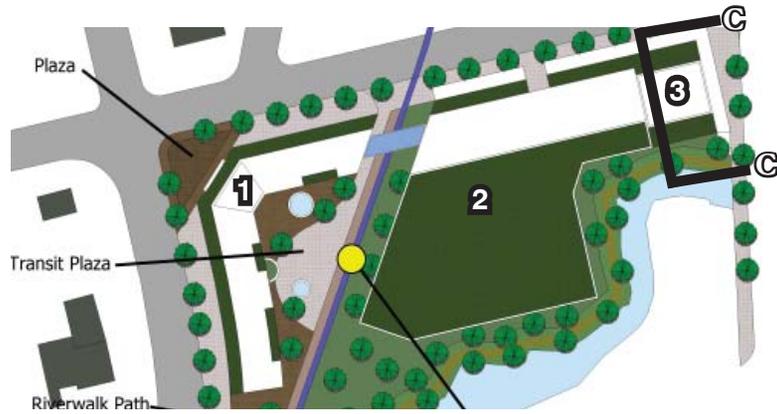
Building Regulations – Section CC (Building 3)
